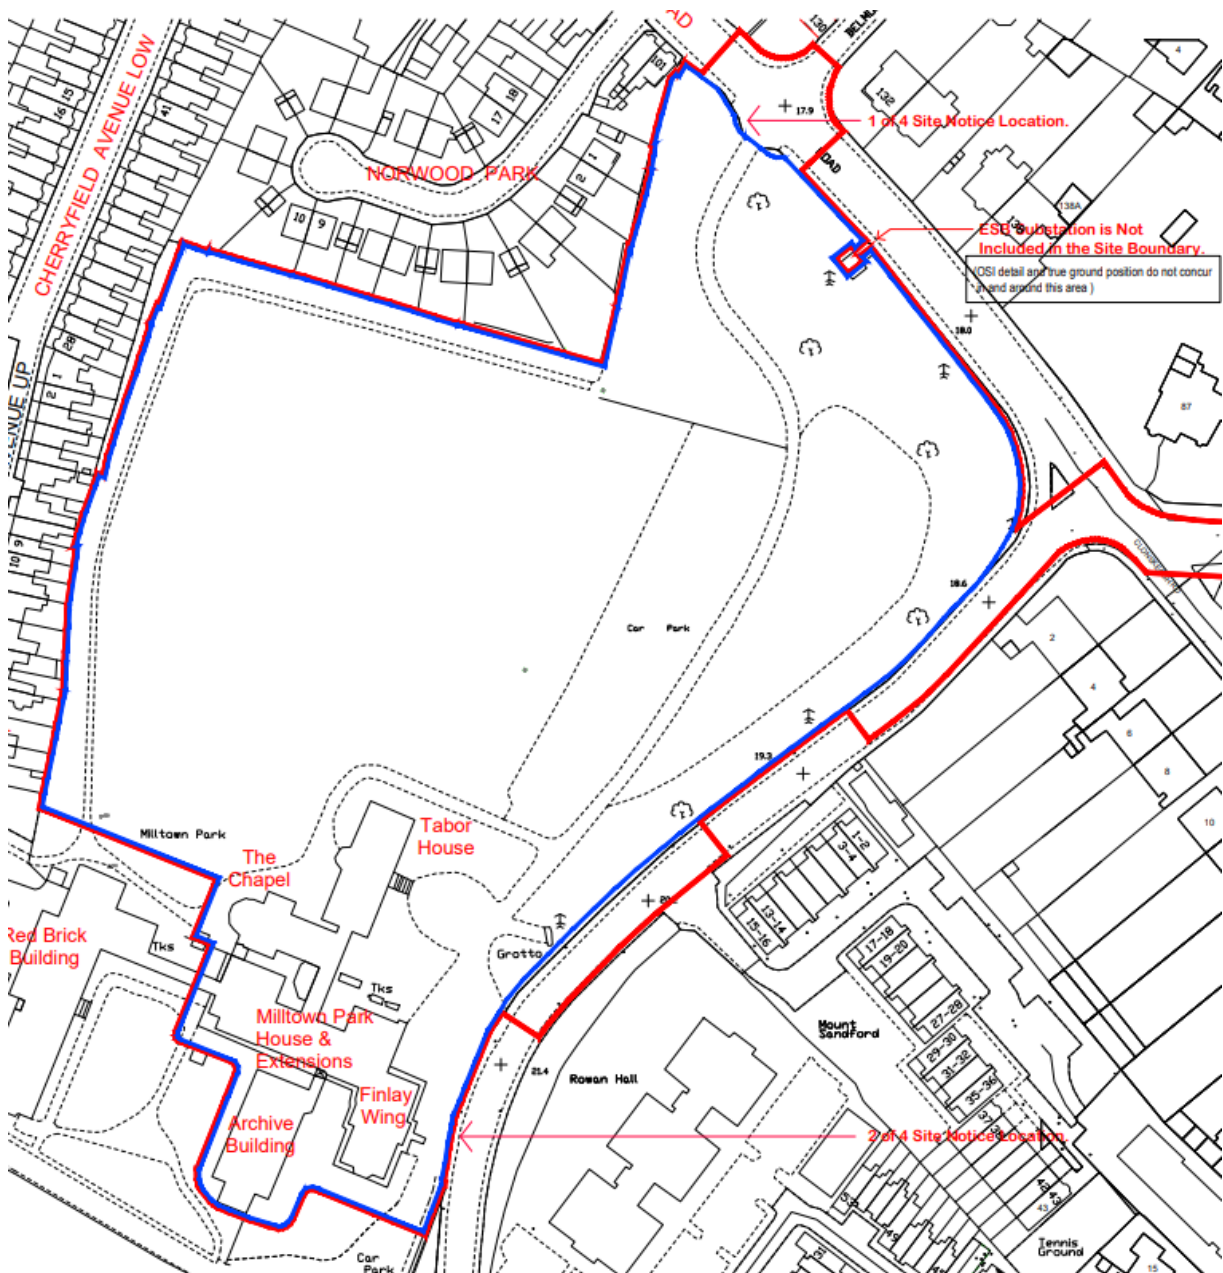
Applicant site boundary enclosing the existing Milltown Park building range
